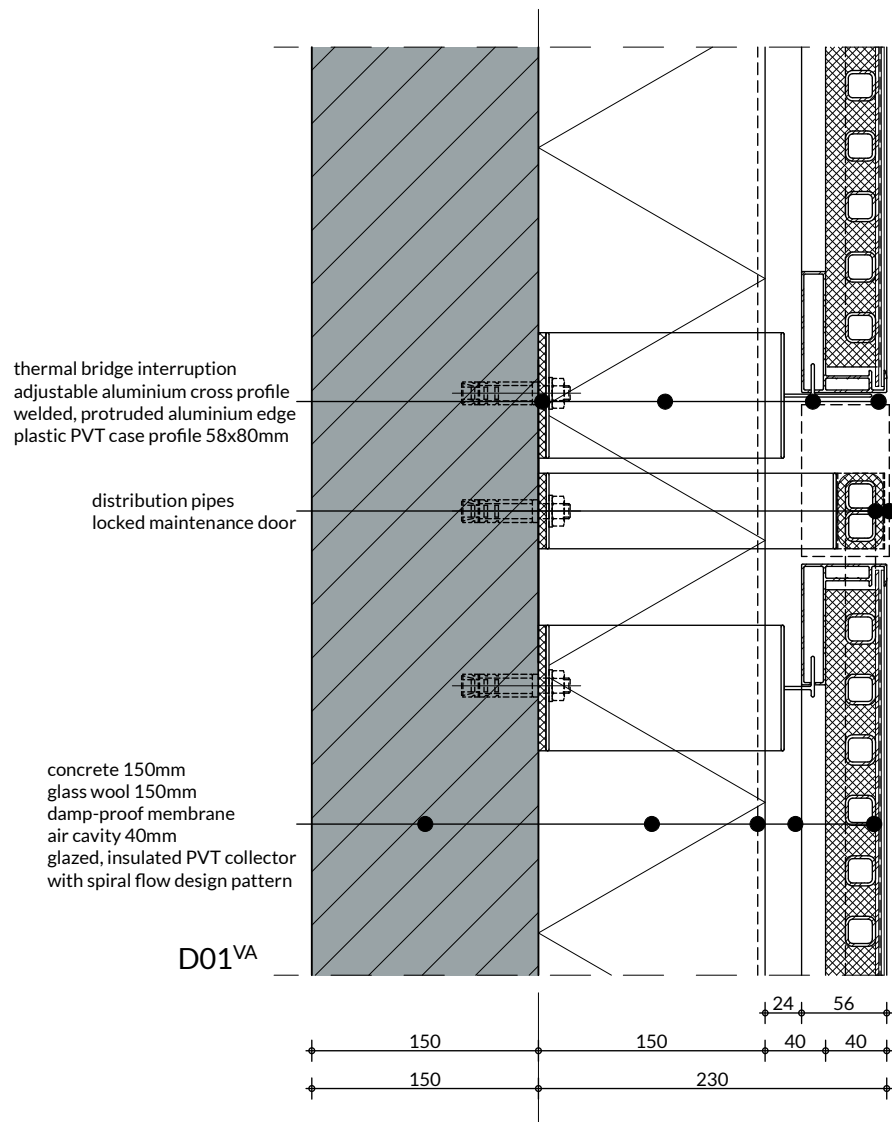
Cavity wall detail D01^{VA}, with the mutual PVT element connection and distribution pipes (scale 1:5; own illustration).
